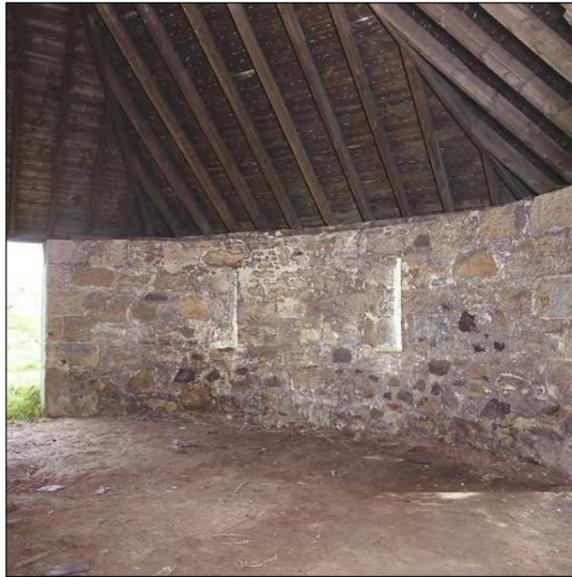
Range A, Horse Engine House slit vents looking south east.
